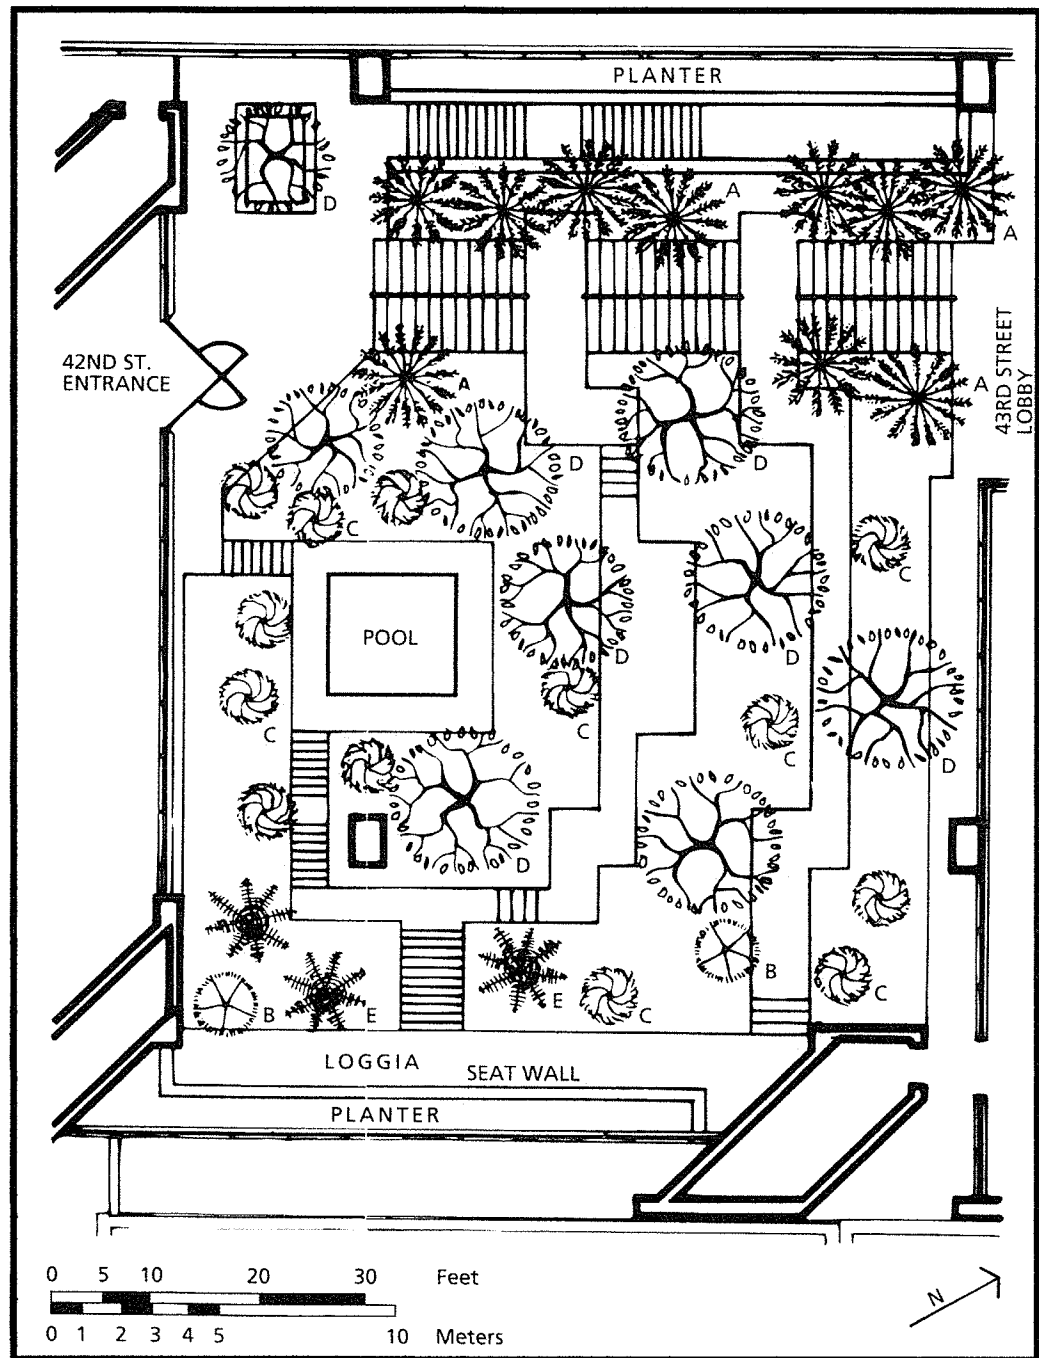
Tree Planting Plan Ford Foundation Source: Nelson Hamner, *Interior Landscape Design*, 1992.
